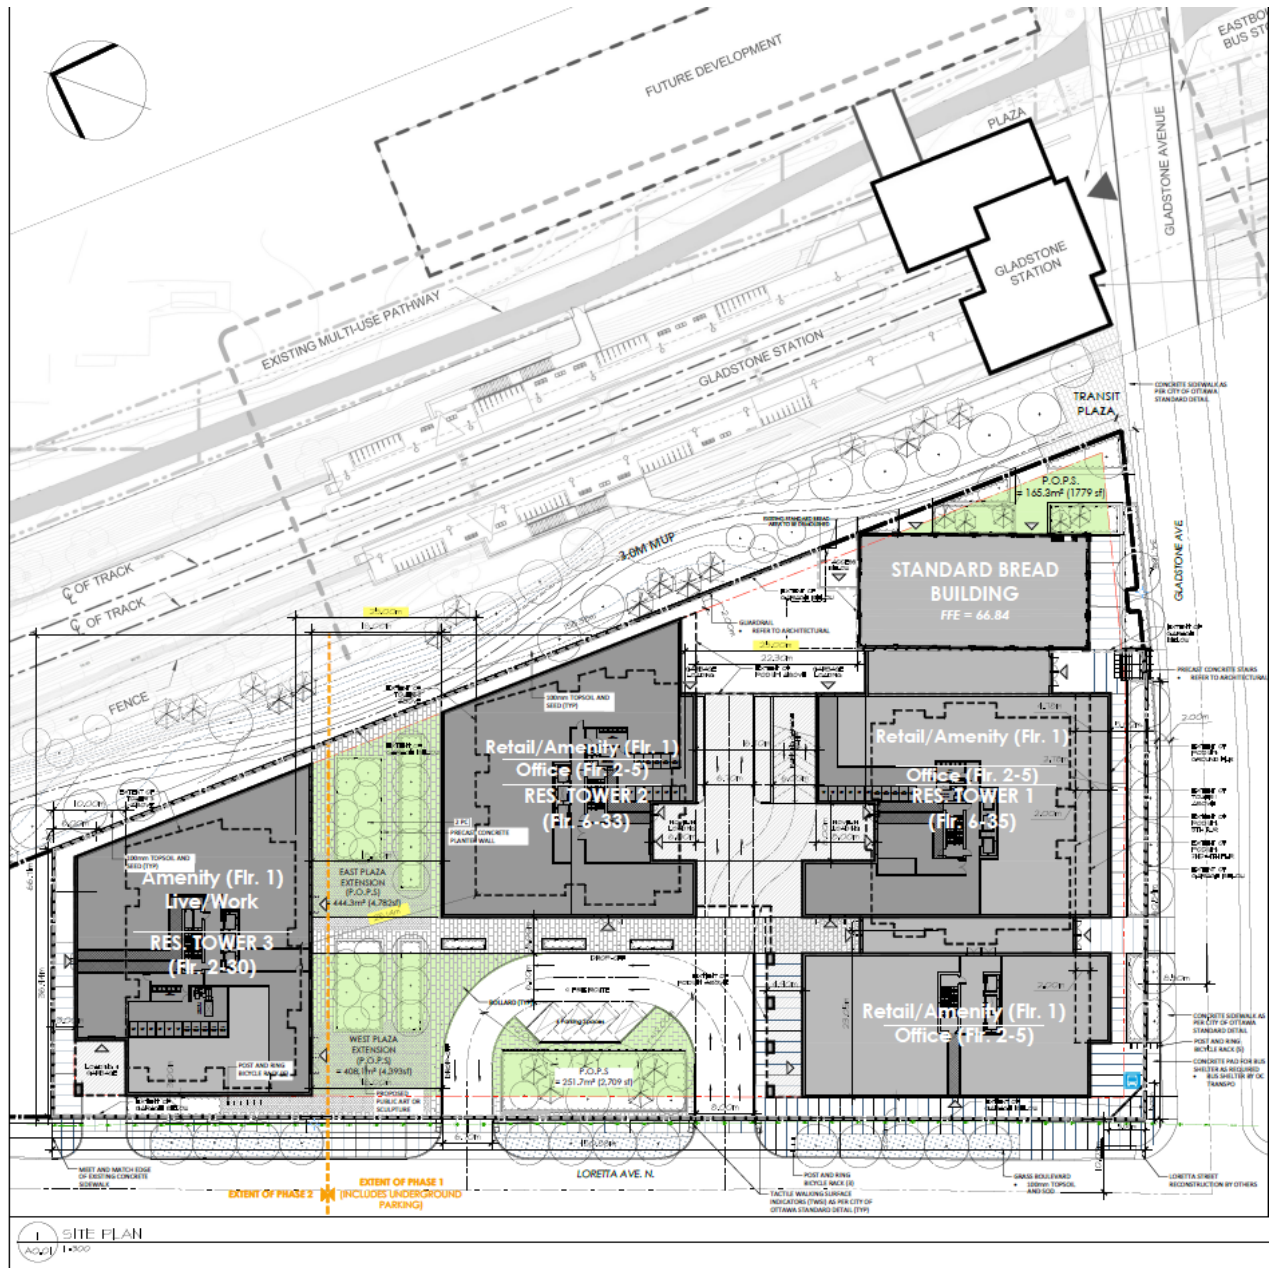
Site plan of the proposed development illustrating its relationship to Gladstone and Loretta Avenues and the O-train corridor. Source: Hobin Architecture 2021.
